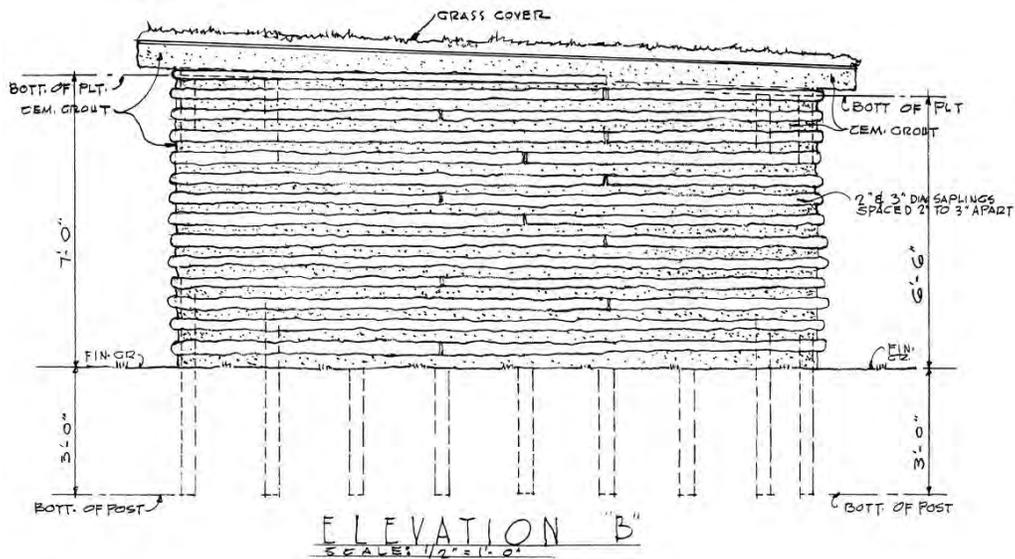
Vietnamese house elevation "B", Camp Gordon, 1966 (standard drawing GOR 28-13-09 sheet 16, Vietnamese and Montagnard houses plans, elevations, and sections, 1 April 1966).
